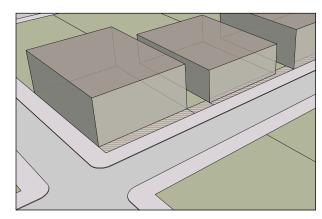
Build-to-zone. The build-to zone is shown hatched.
